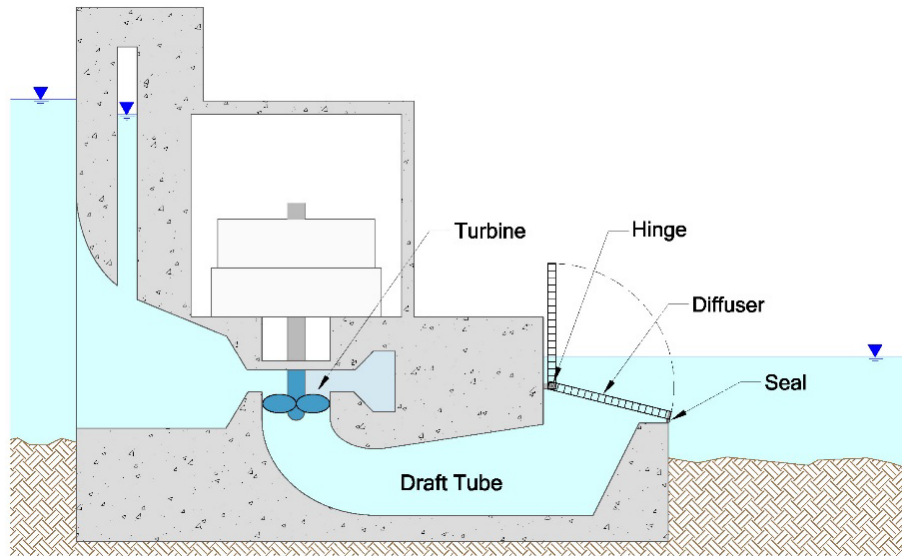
Layout of a horizontal outlet diffuser covering the entrance to a turbine draft tube
